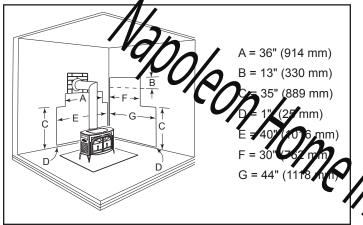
Parallel installations with rear wall pass-through, two wall shields. Reduced clearances for both rear and side walls. Wall shields may meet at corner if desired. Shielding for connector is centered behind connector. Wall pass-through must comply with codes.
